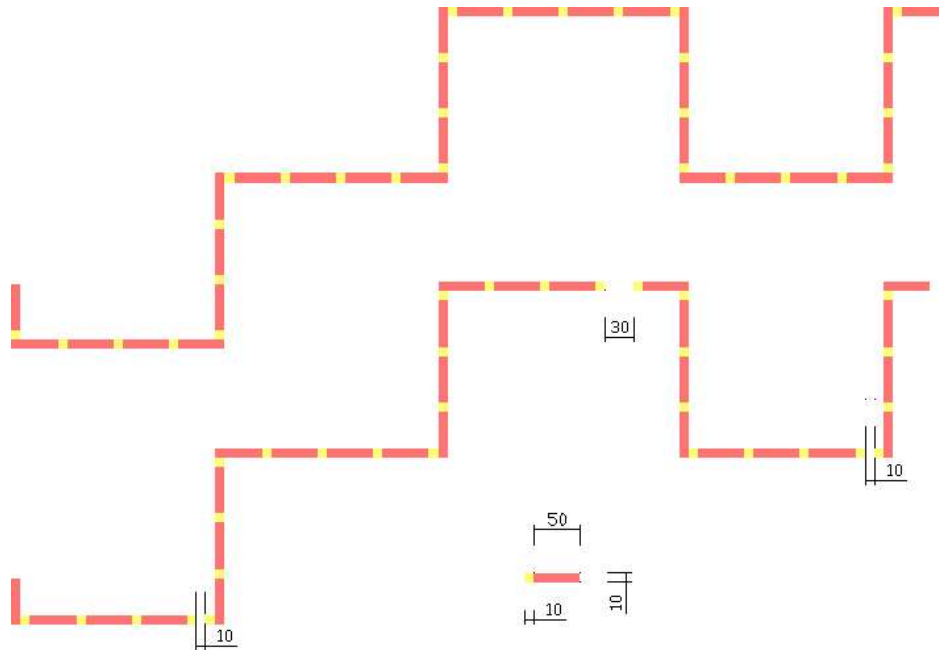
The staggered rows of a façade section require adjustments when a non modular component is used
